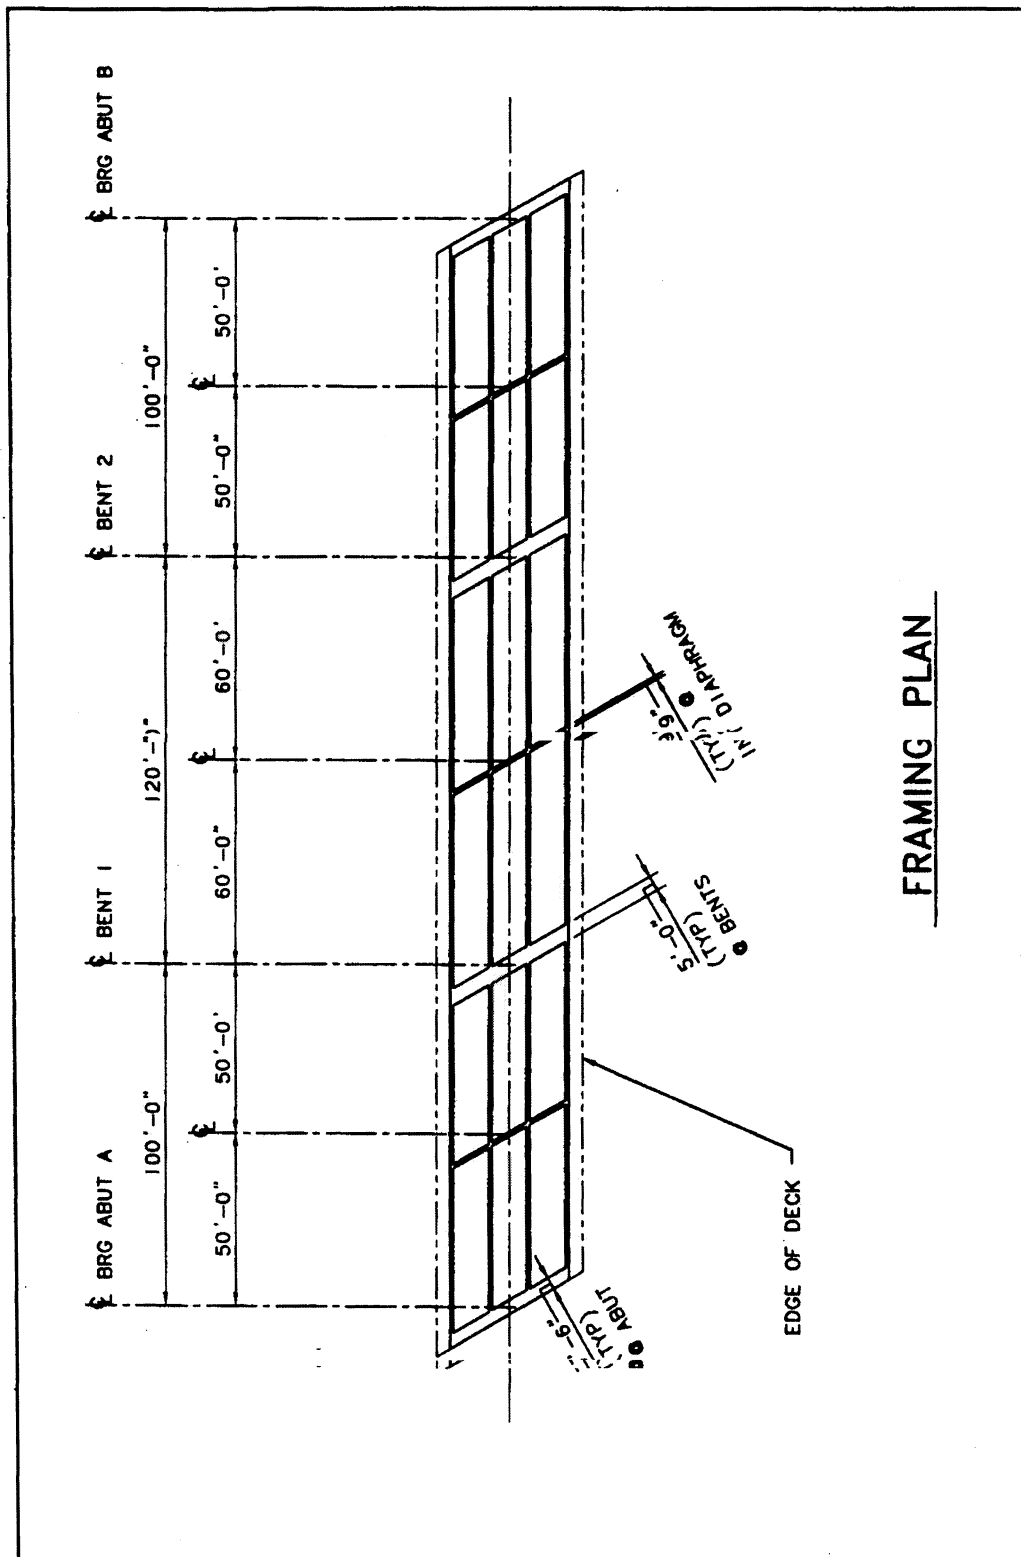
Bridge No. 4 – Box Girder Framing Plan
